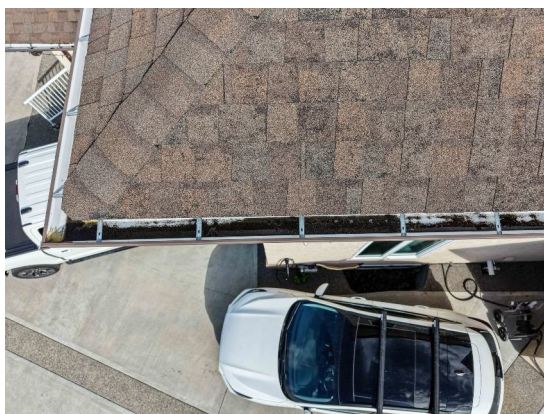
Detail 1 — Roofing Material / Shingle Granule Loss, Multiple.
